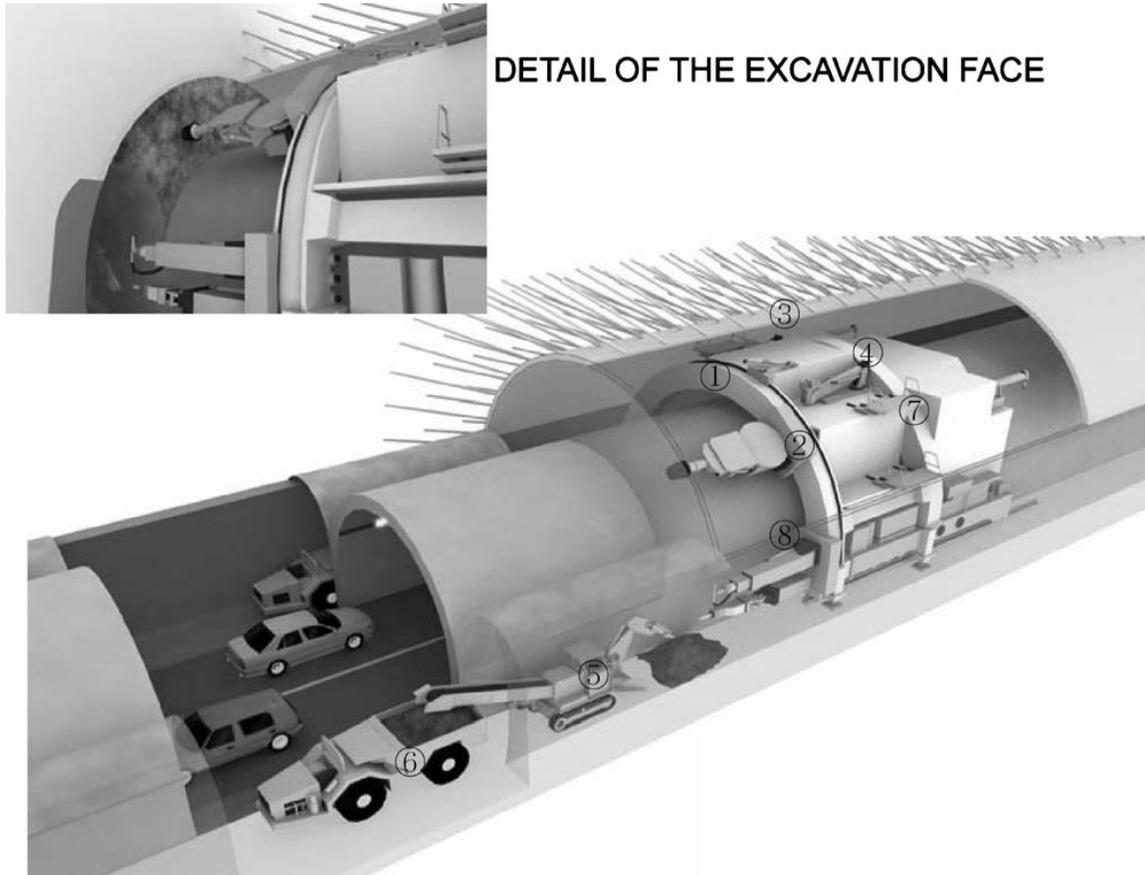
Arch Cut Method: 1) Arch Cut Excavator; 2) Road-Header; 3) Bolter; 4) Steel Set Erector; 5) Muck Loader; 6) Dump Truck; 7) Working Platform; and 8) Shotcrete Nozzle (Reference 1)
